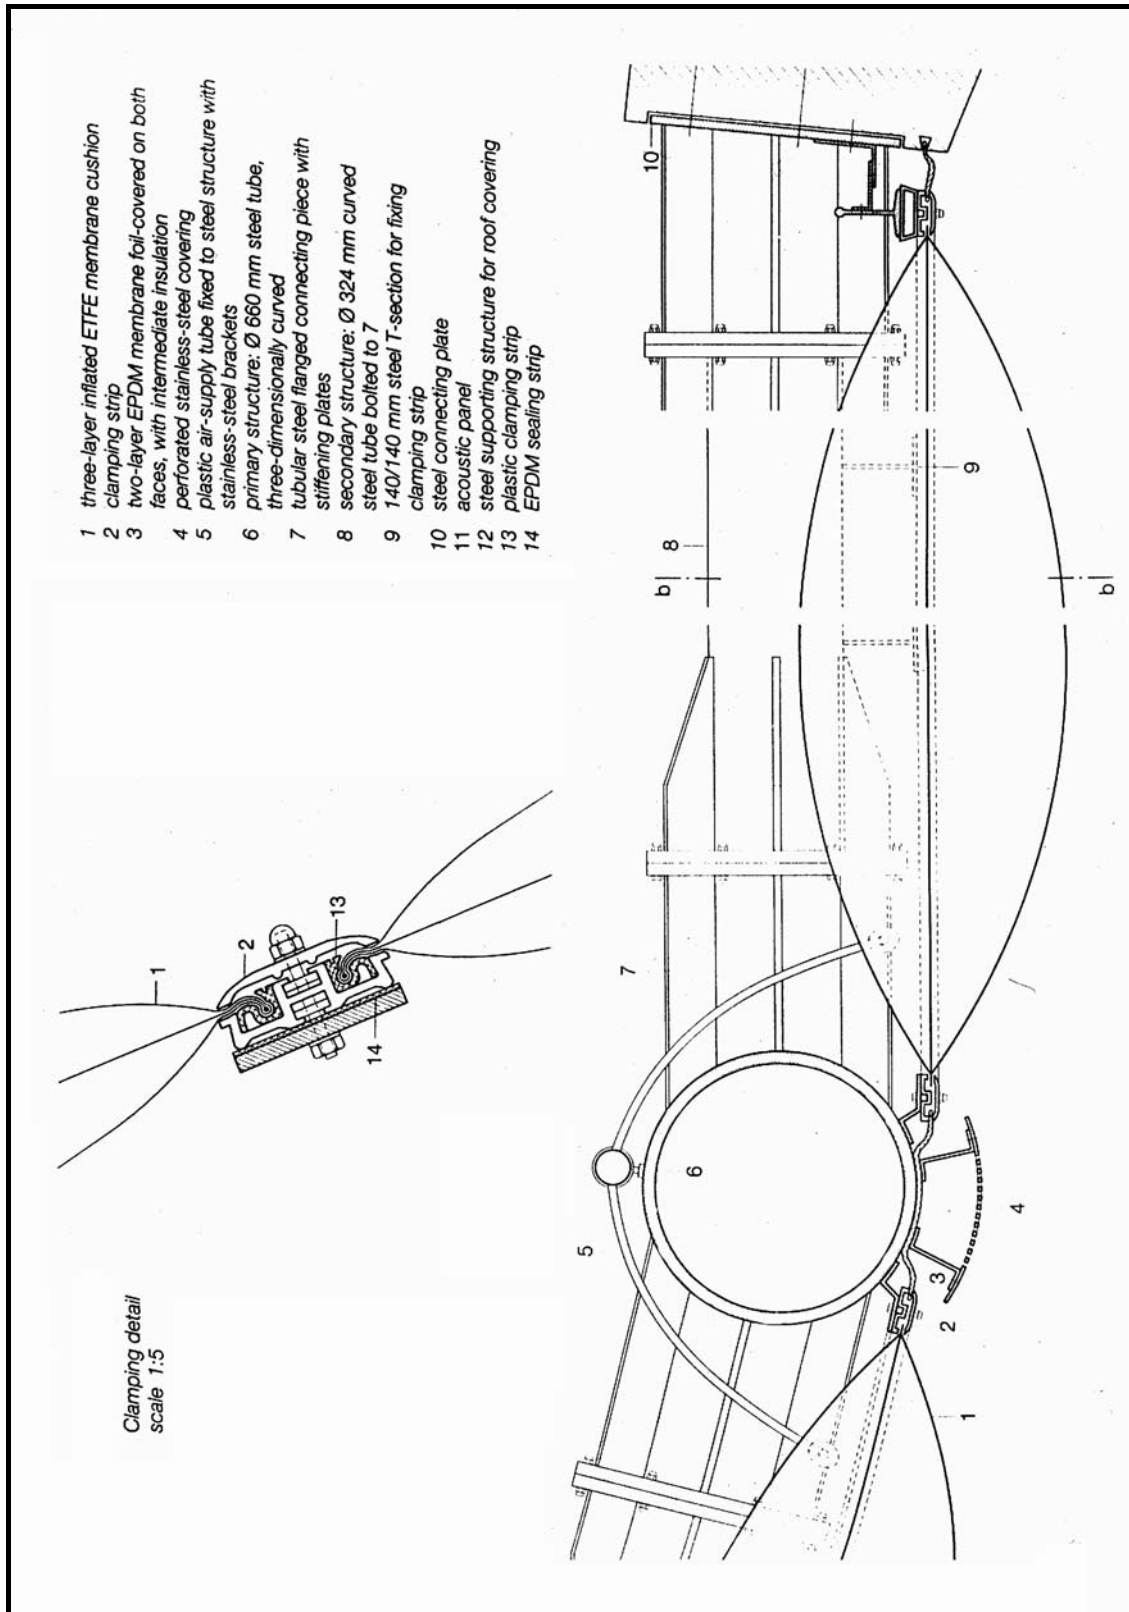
28. NSSC Clamping Detail And The Section Of The Structure
